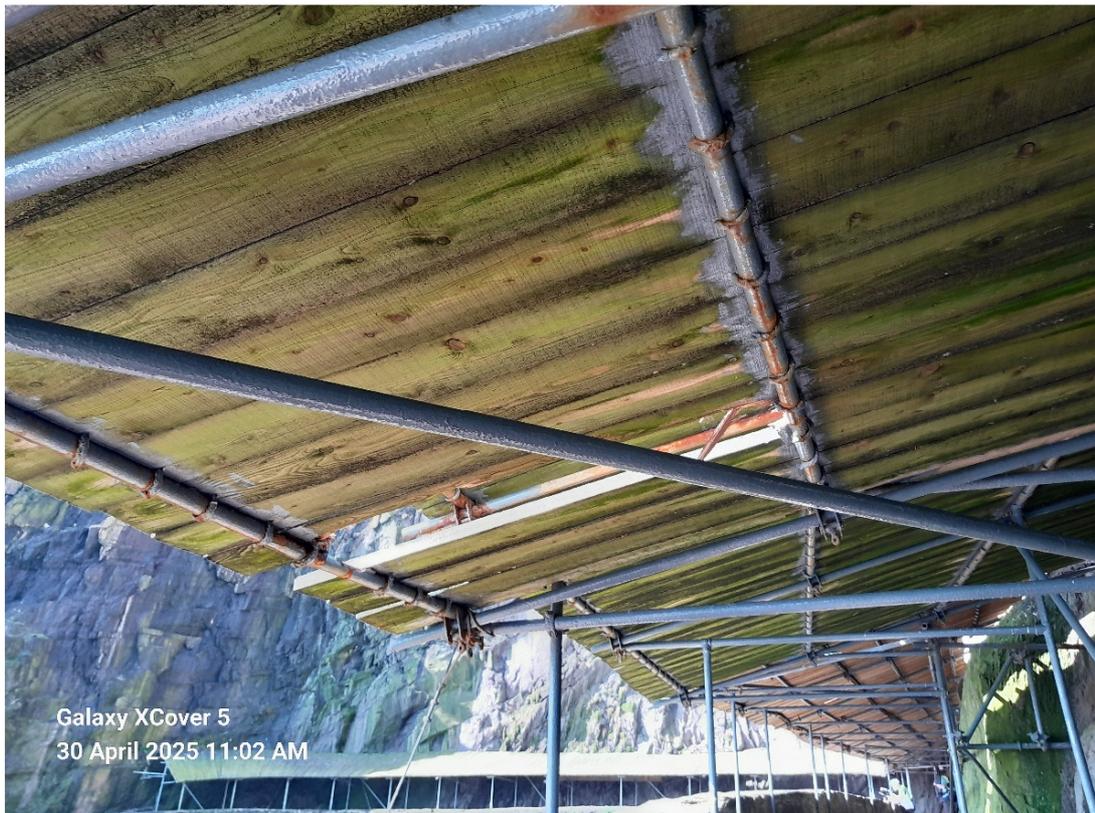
Damage from rock fall to the timber protection canopy at Cross Cove
